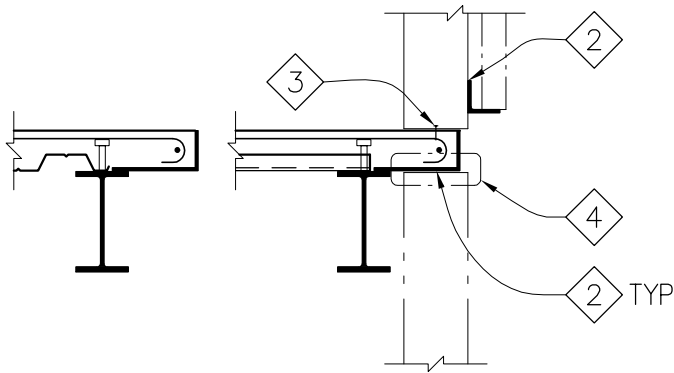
METAL STUD CONSTRUCTION ISSUES - CASE A: BALLOON FRAMING
